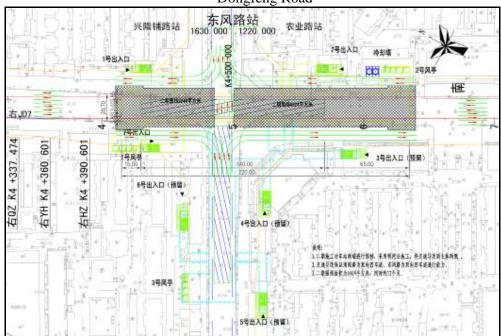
Traffic organization and construction fencing of the Second phase on Dongfeng Road
